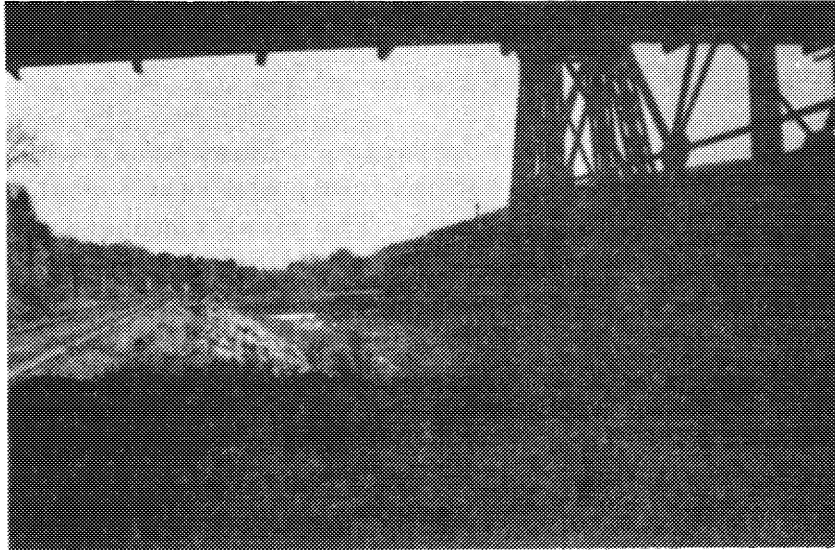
West Warren local protection, showing upstream channel and dam improvements. Mile 12.9.
